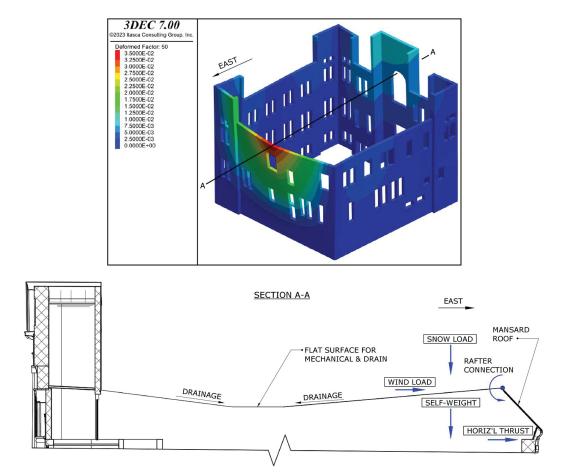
The top image shows predicted displacement fields on the east wall due to wind loading. In general, the modelled pattern agrees with site observations. The bottom image shows a cross section through the roof, denoted A-A in the top image, and the forces acting on the east wall..
